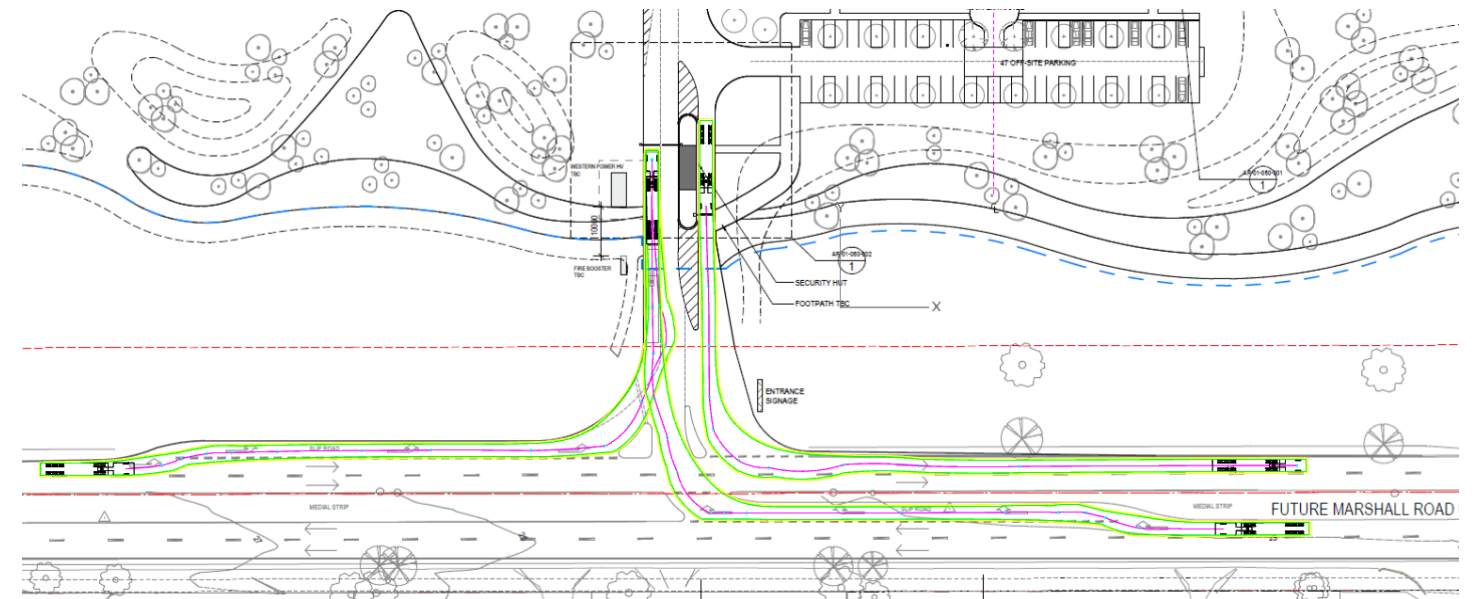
Service vehicle movements through the proposed ultimate site access with combined Malaga Site entry and exit road layout and future duplication of Marshall Road (source: Hassell, January 2023)
